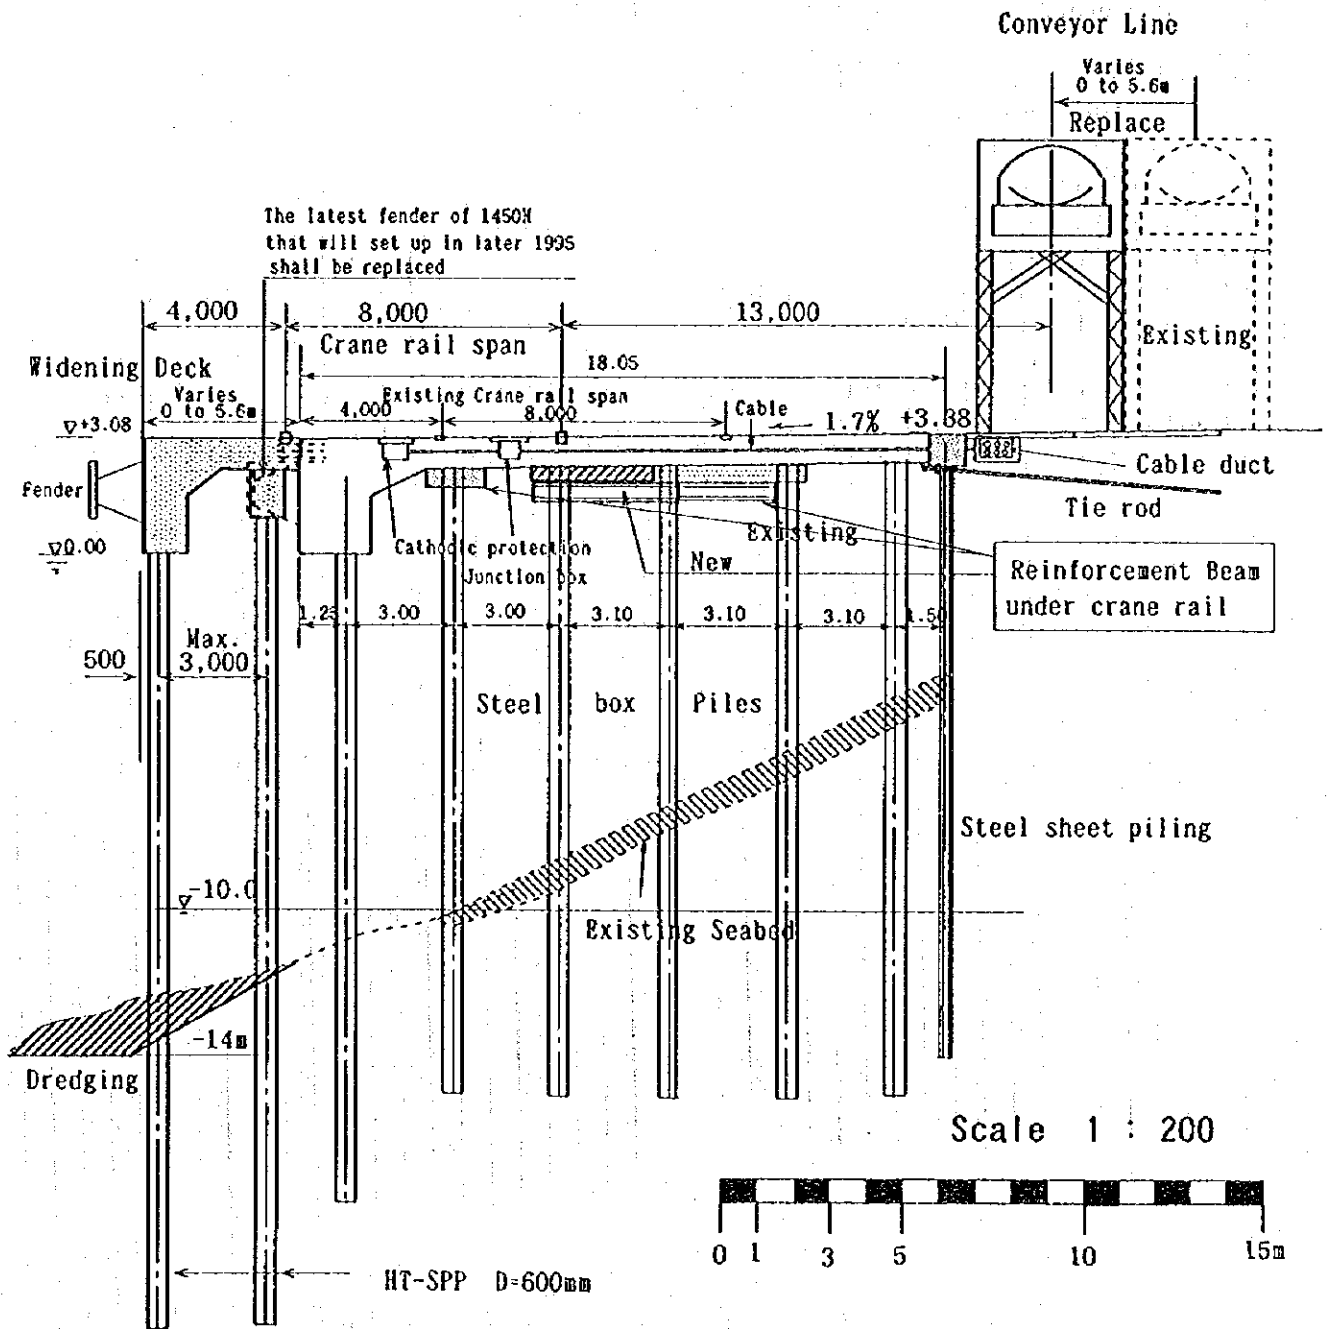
(1) Typical Section of New Grain Berth at GC Berth No.1
